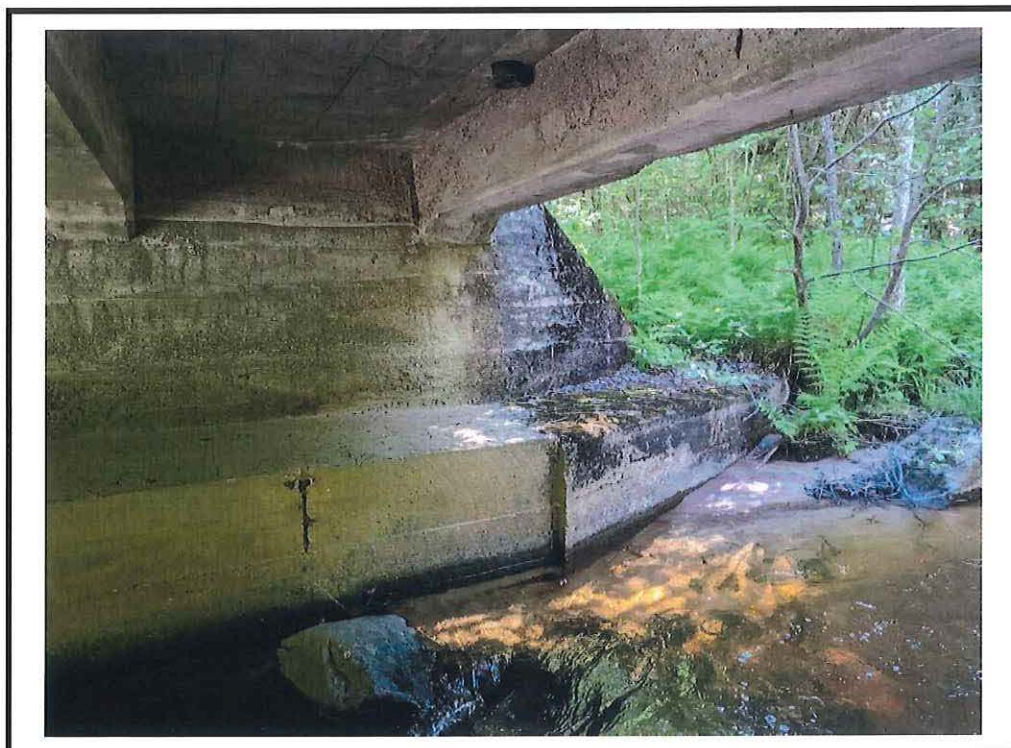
Spall with exposed corroded reinforcing steel on abutment wall
